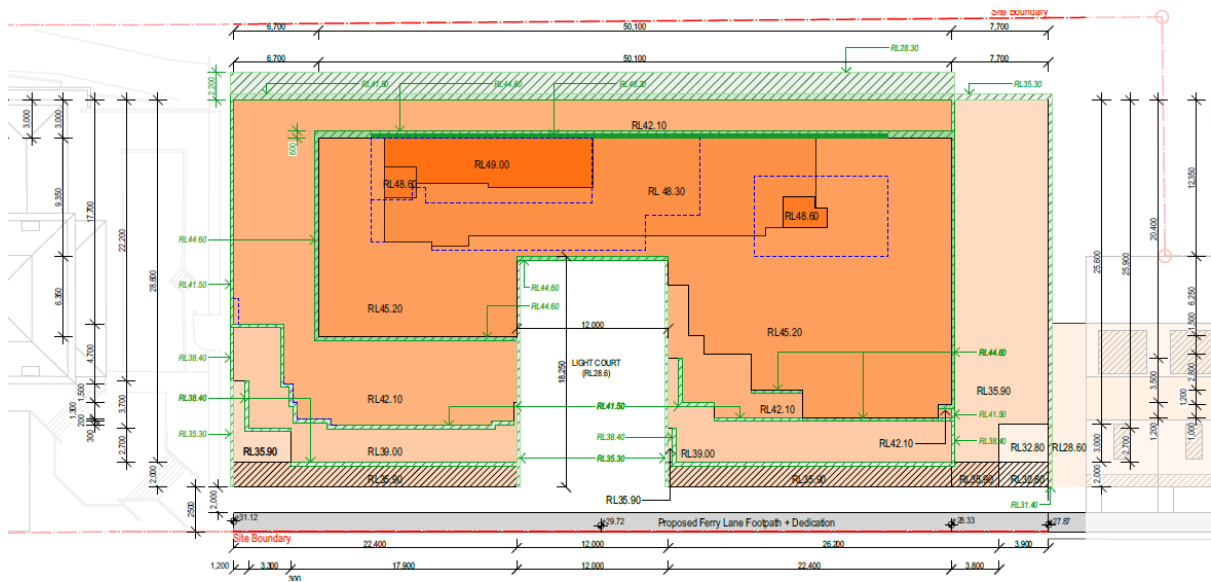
Proposed envelope detail/setbacks: residential flat building (green areas indicate articulation zone)
